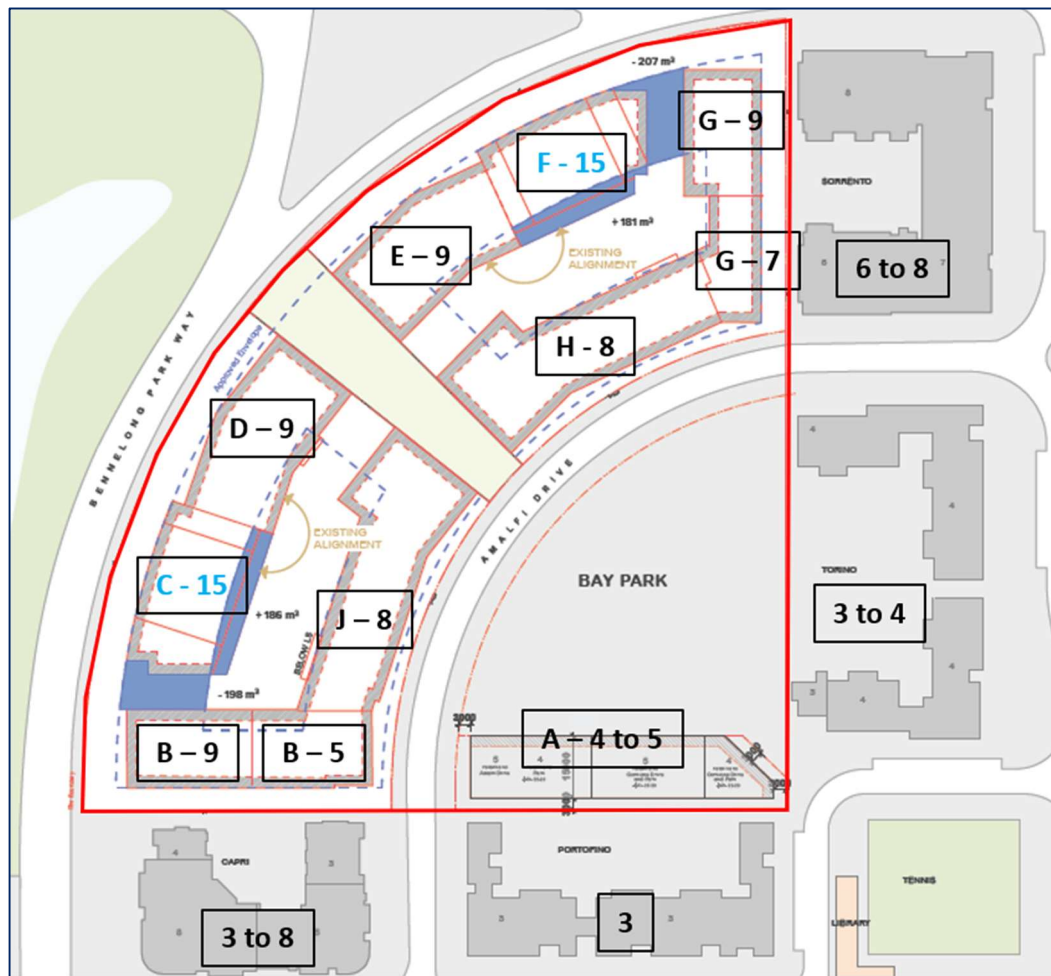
| Existing and proposed building heights within the subject site and surrounding sites and amendments to the building footprint (blue) (Source: FRIS Urban Design Report)
